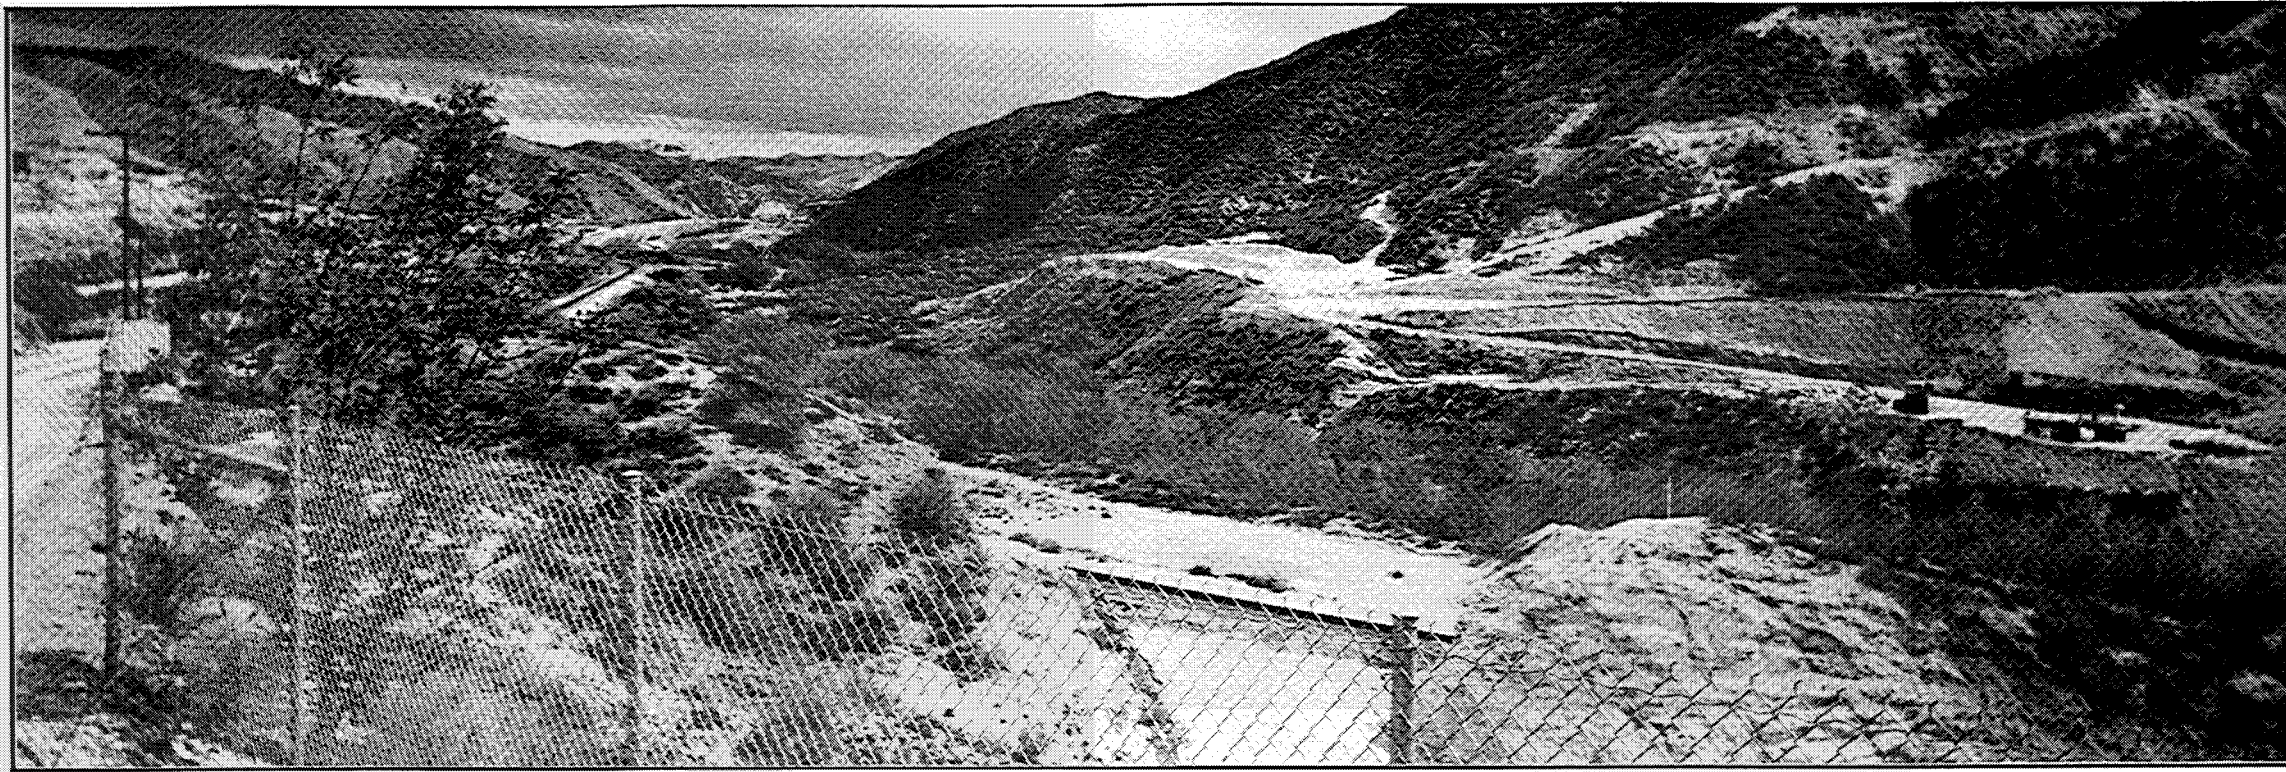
Santa Clara Riverbed adjacent to site, looking northeast.
